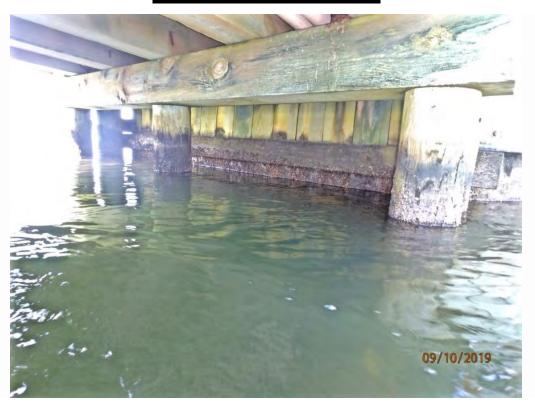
General view of west abutment bent & bulkhead, mildew staining & marine growth throughout
